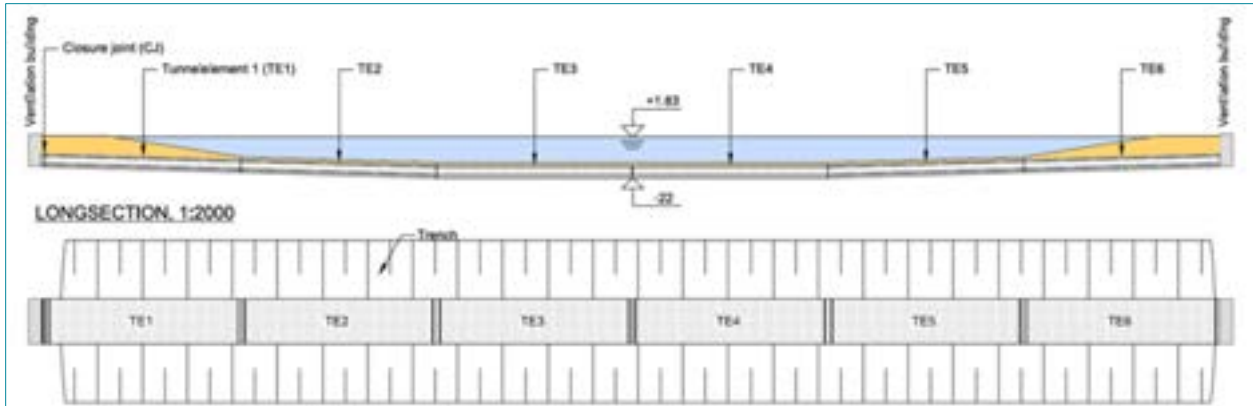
Longitudinal Section of the Tunnel (not to Scale)
